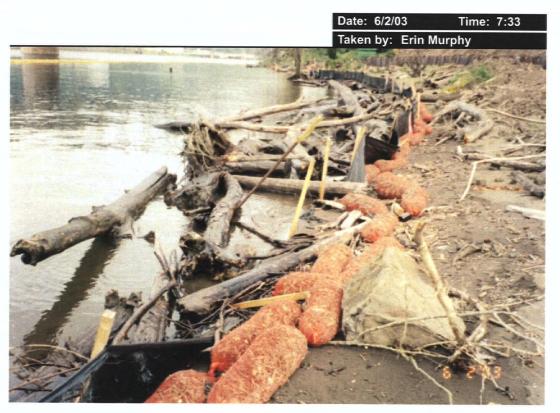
Silt fence and bio-bags on northwest beach after a high water event. Direction: Northwest
